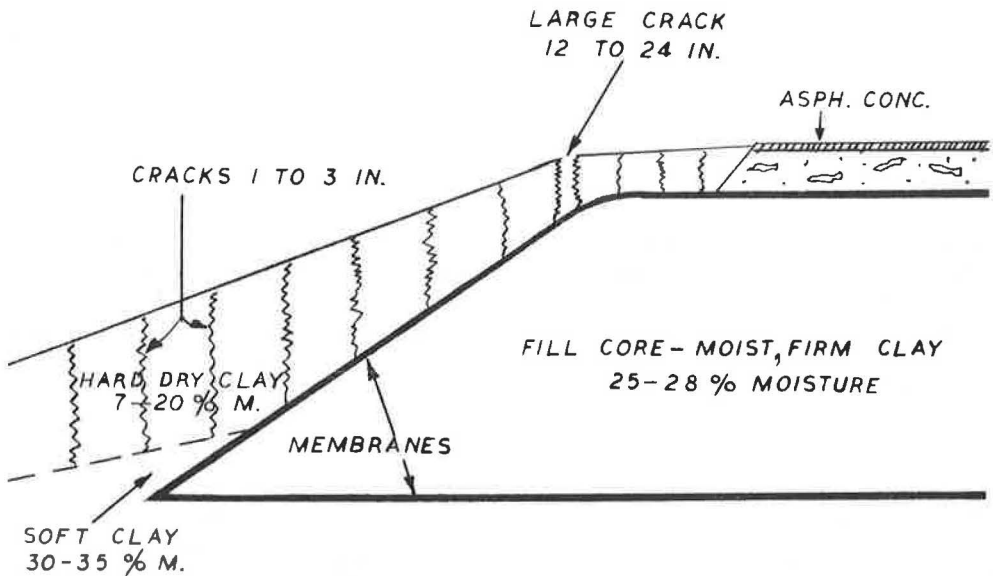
Cross-section near bridge end, Str. 13, summer 1952.
